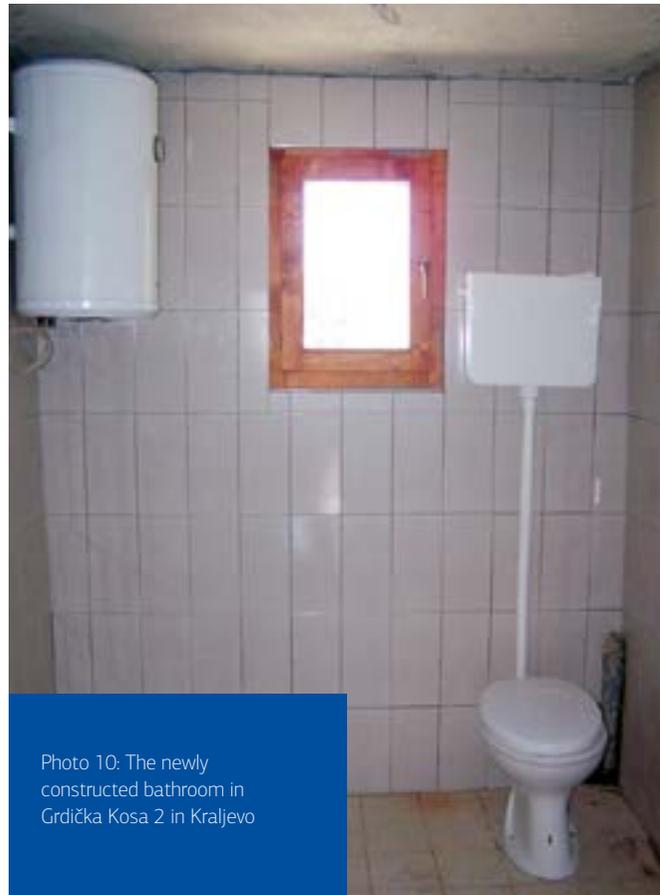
The newly constructed bathroom in Grdička Kosa 2 in Kraljevo
